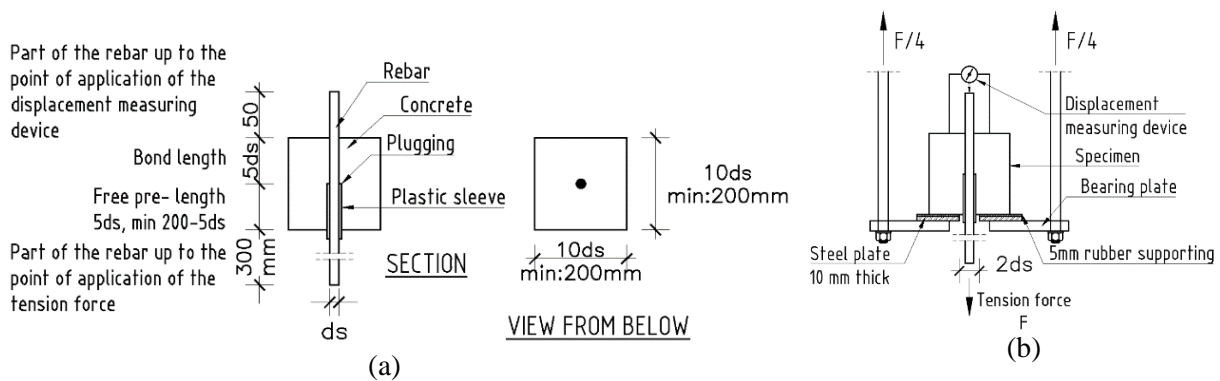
(a) Dimensions of cube specimen (b) Testing setup
